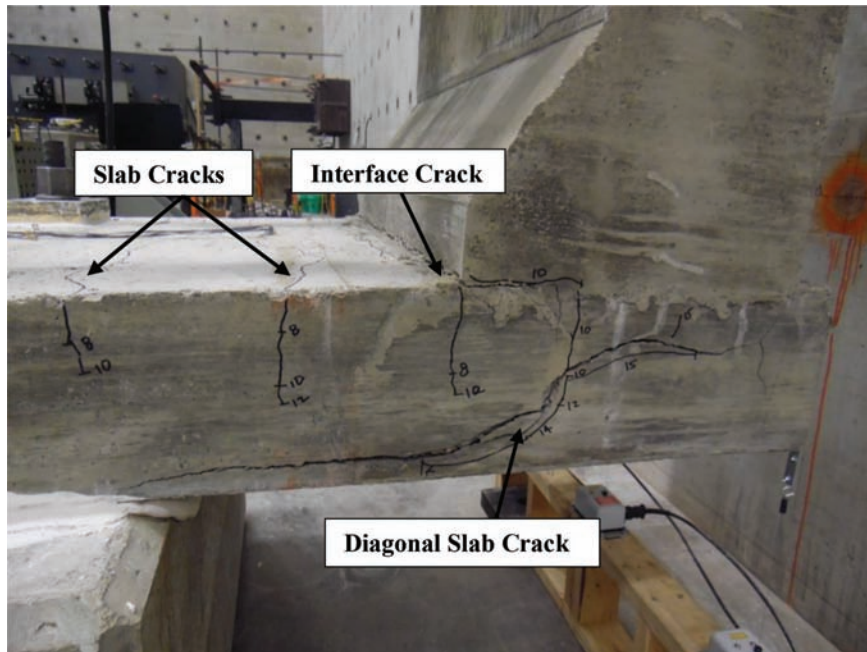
Strip Specimen 1 failure plane at 14 kip.
